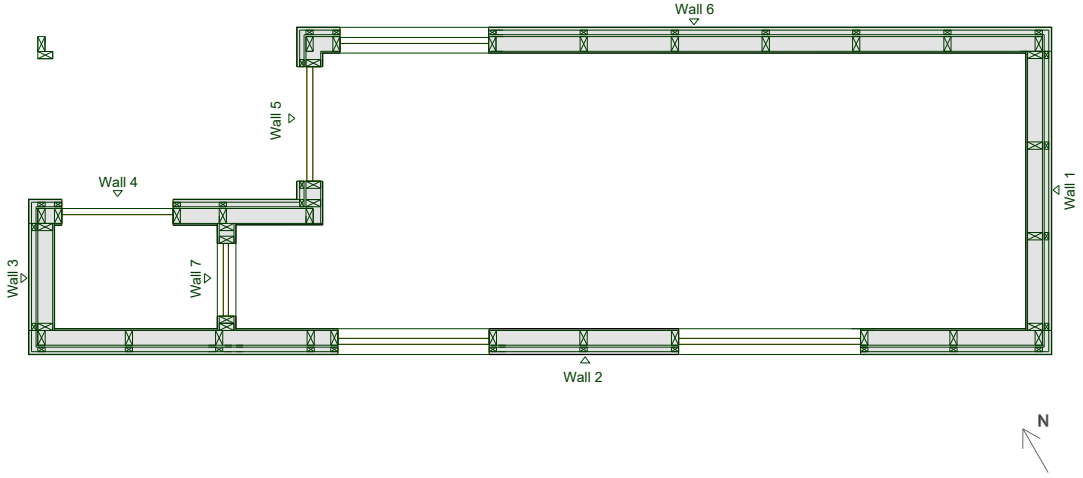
CONSTRUCTIONAL WALL'S PLAN BEFORE BUILD
